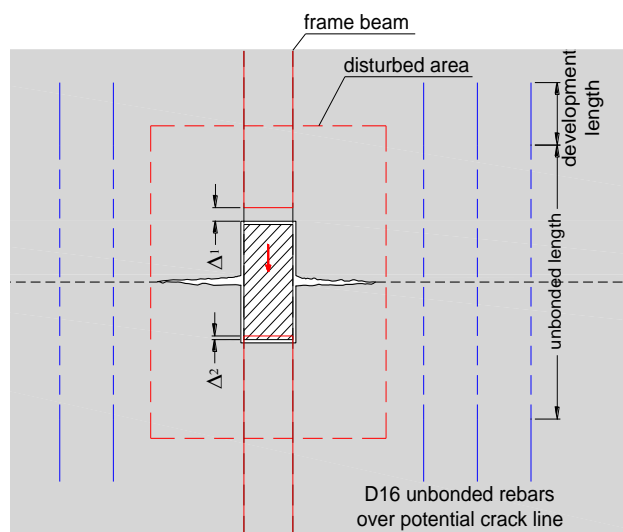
Cracking due to frame (beam) elongation on an internal column
